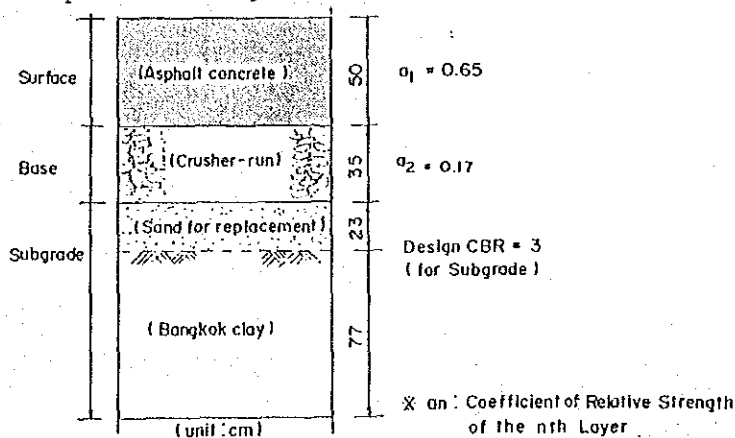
Present Pavement Composition at Itsaraphap Road
